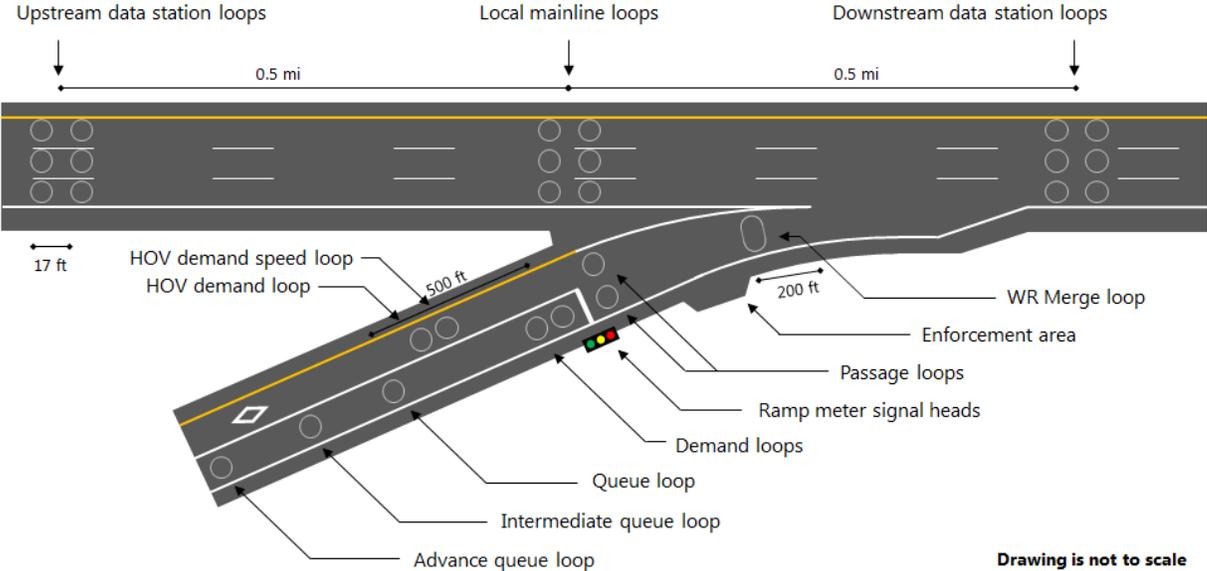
Typical ramp meter layout without HOV ramp metering
